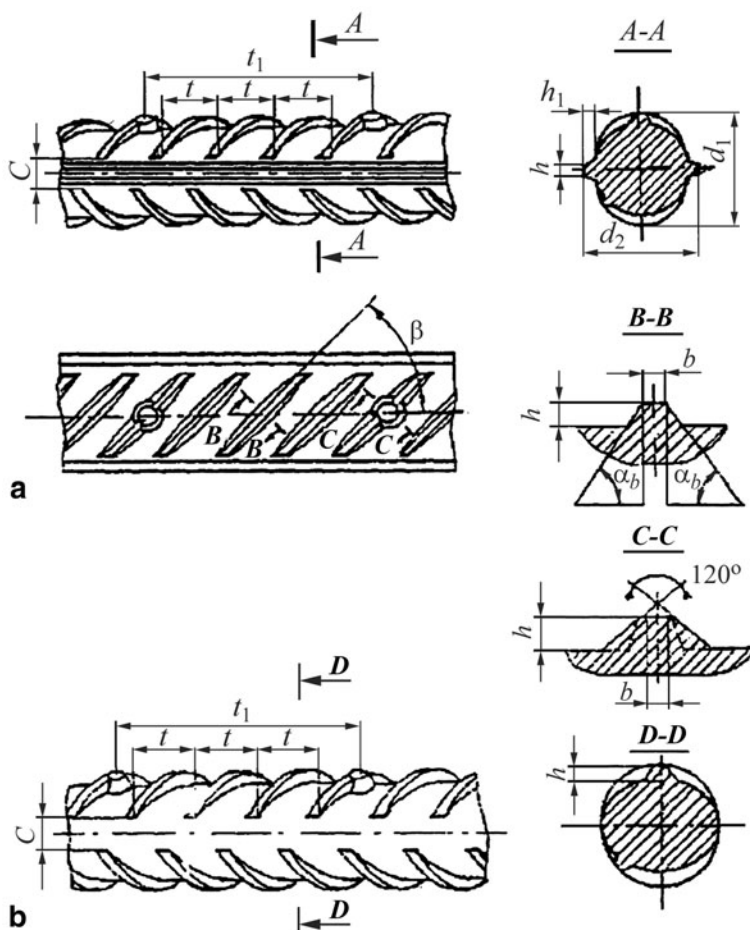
Geometry of periodic hardened profile for rolled reinforcing bars
